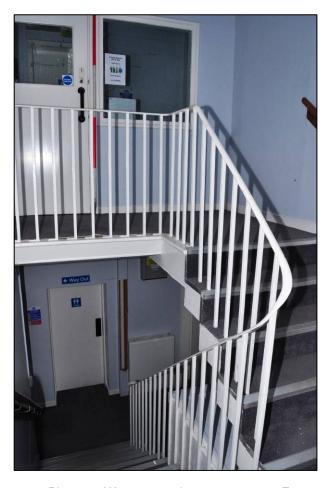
West range, later part, room 1F1 (landing), looking E (photo 1/2996).
